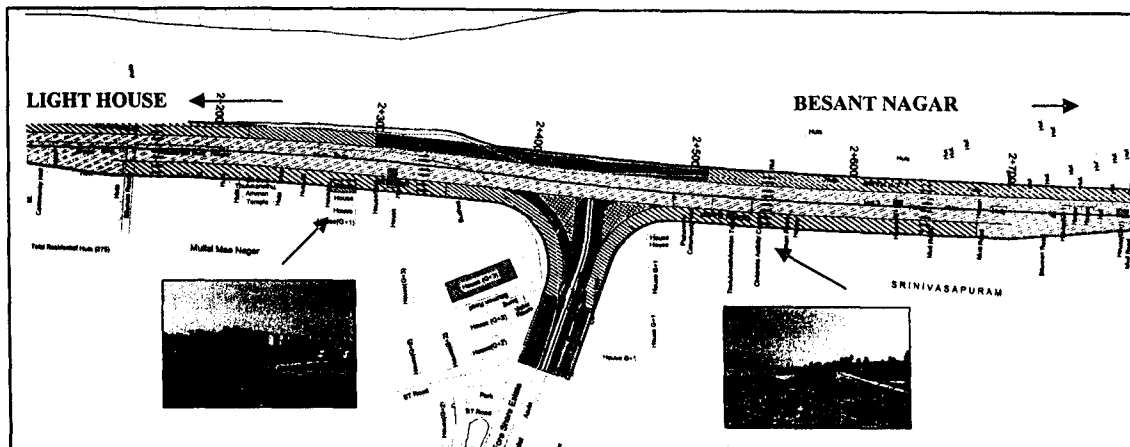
Proposed Entry and Exit Ramp Arrangements at Fore Shore Estate junction
